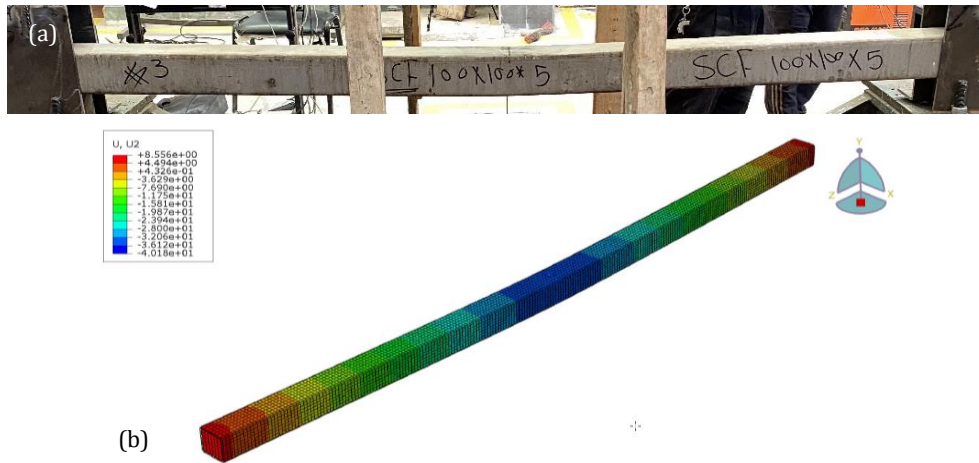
Deformed shape of 100X100X5 filled single-cell column (SCC-F):
